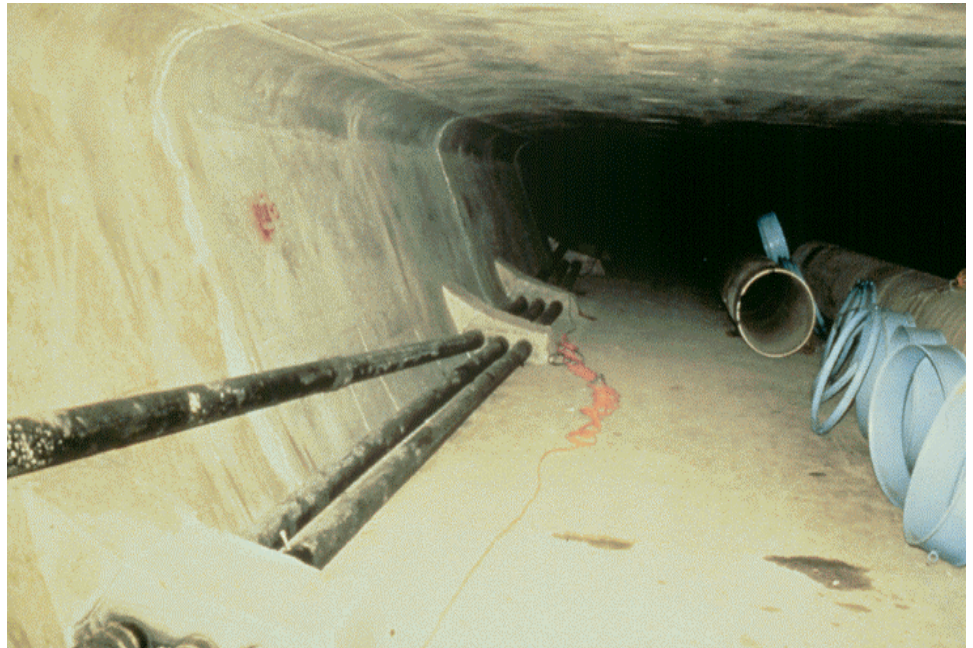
Inside View of Externally Post-tensioned Box Girder
